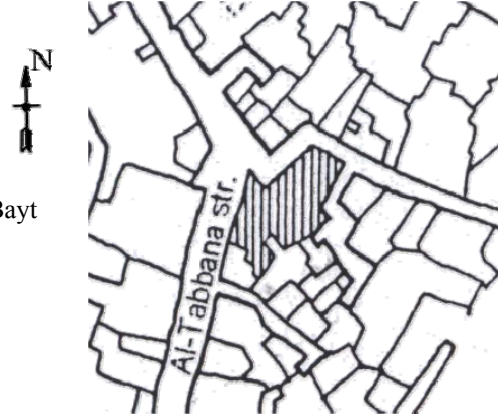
144 Site Layout Plan Bayt Zar' al-Nawa
